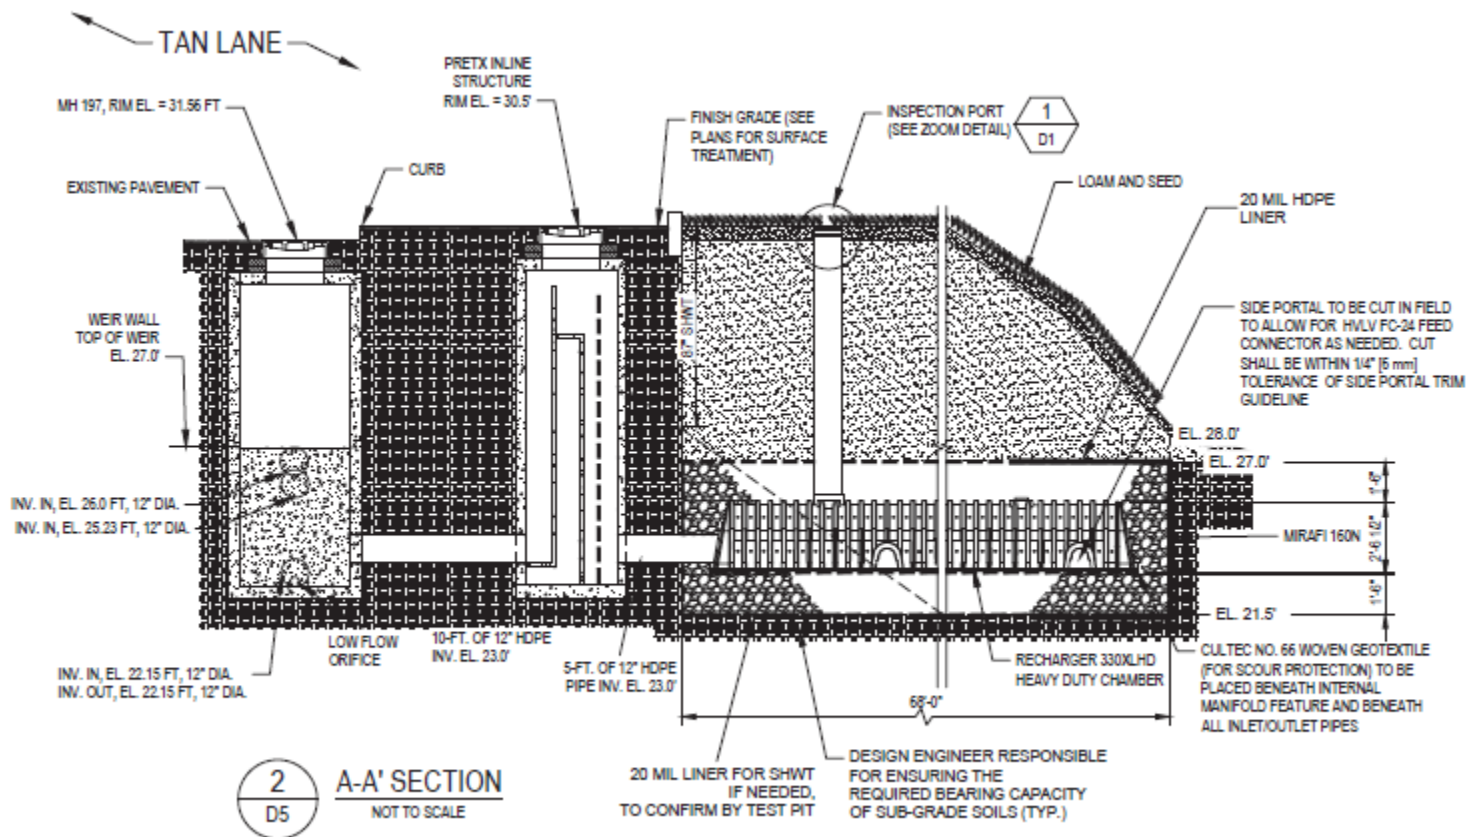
Engineering Section Detail for Subsurface Infiltration System BMP 9
